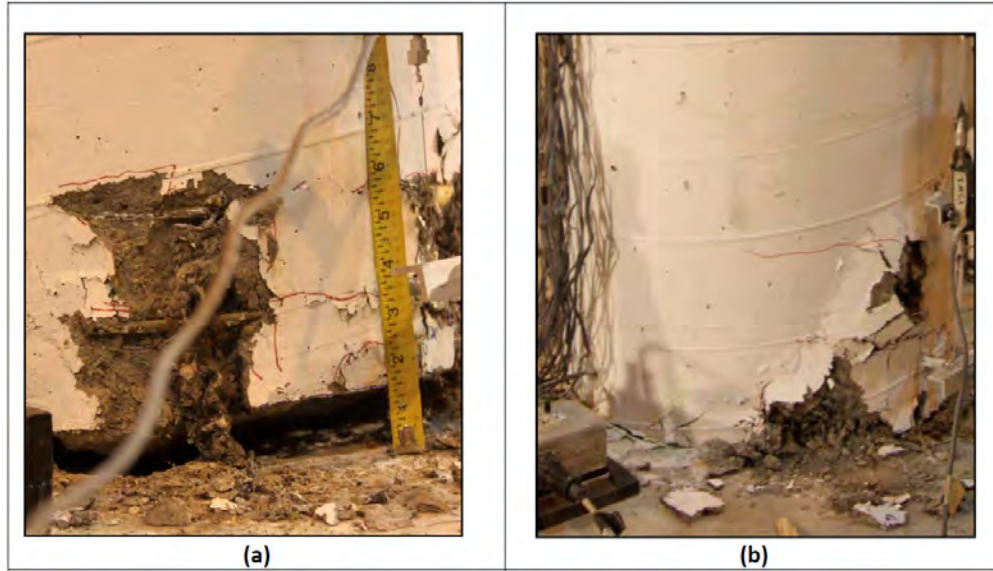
Damage state of column's base: (a) $\theta_r = 9.5\%$, east face of the column; and (b) the final cycle of $\theta_r = 11.3\%$, west face of the column.
